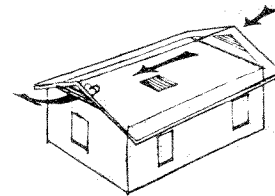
Ventilating fans should be used to reduce air-conditioning loads.
